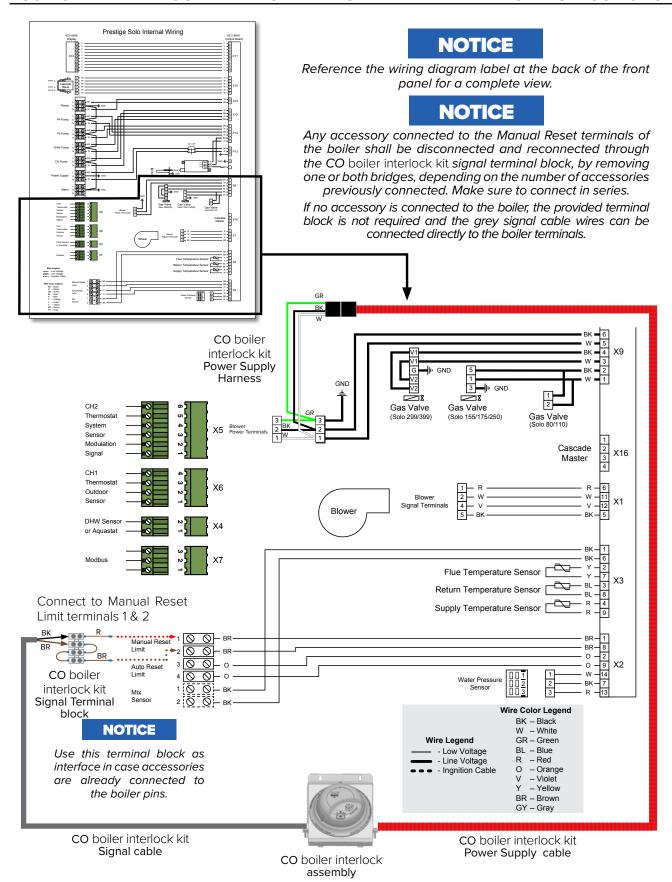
Prestige Solo PA Boilers - Where to Connect the CO Boiler Interlock Kit
